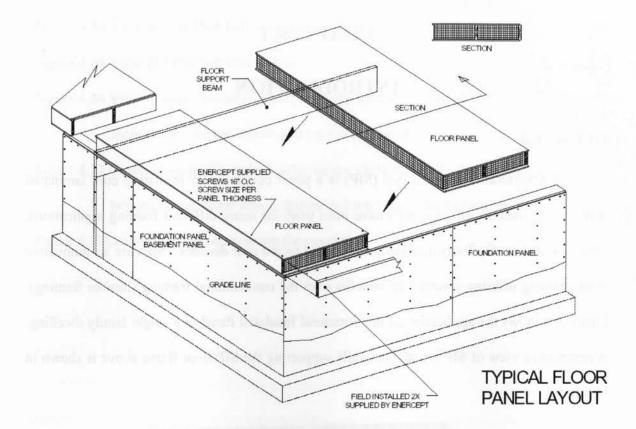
A perspective view of SIP foundation walls supporting the SIP floor frame above
